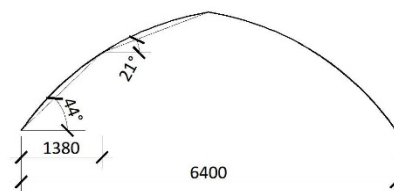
Pitch of the roof slopes used to describe wind loads [source: authors' archive]
